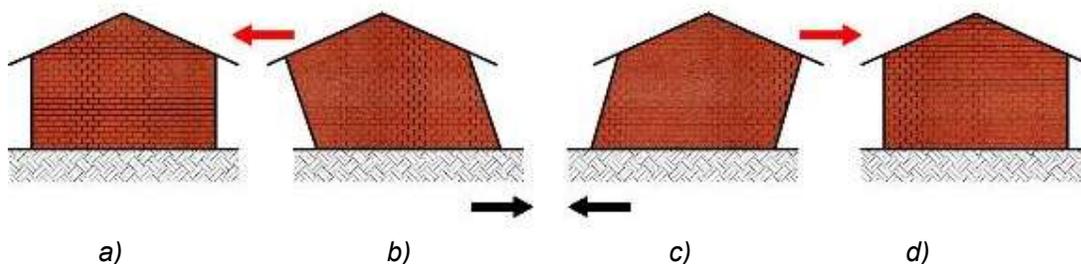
Building response to earthquake motion: a) building at rest; b) ground accelerates to right; c) ground accelerates to left, and d) ground and building at rest.
